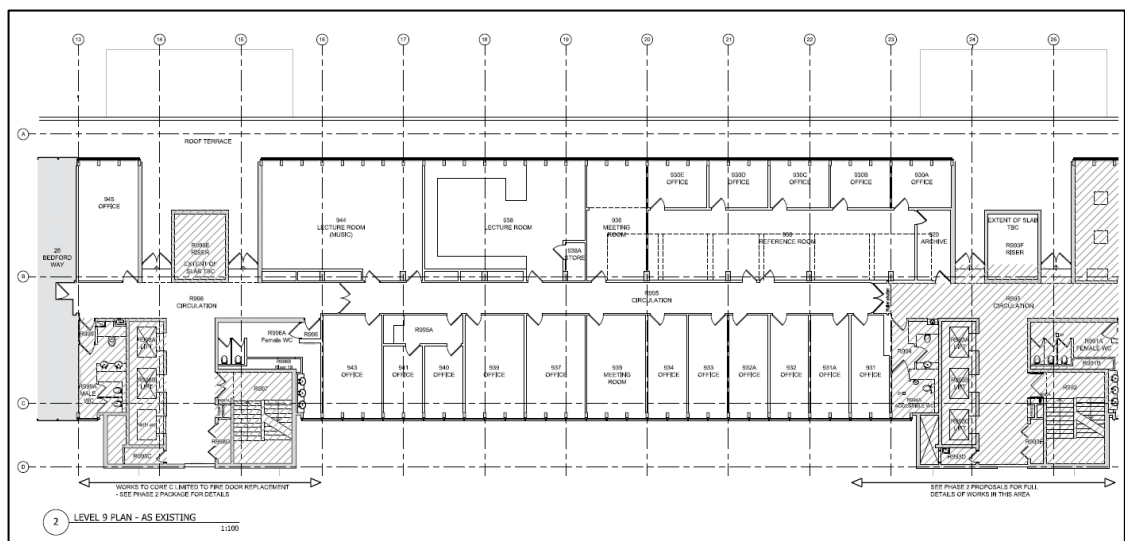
Existing Floor Plan (Source: Architon LLP, drawing ref. 3146-WS2-0901 P2)
